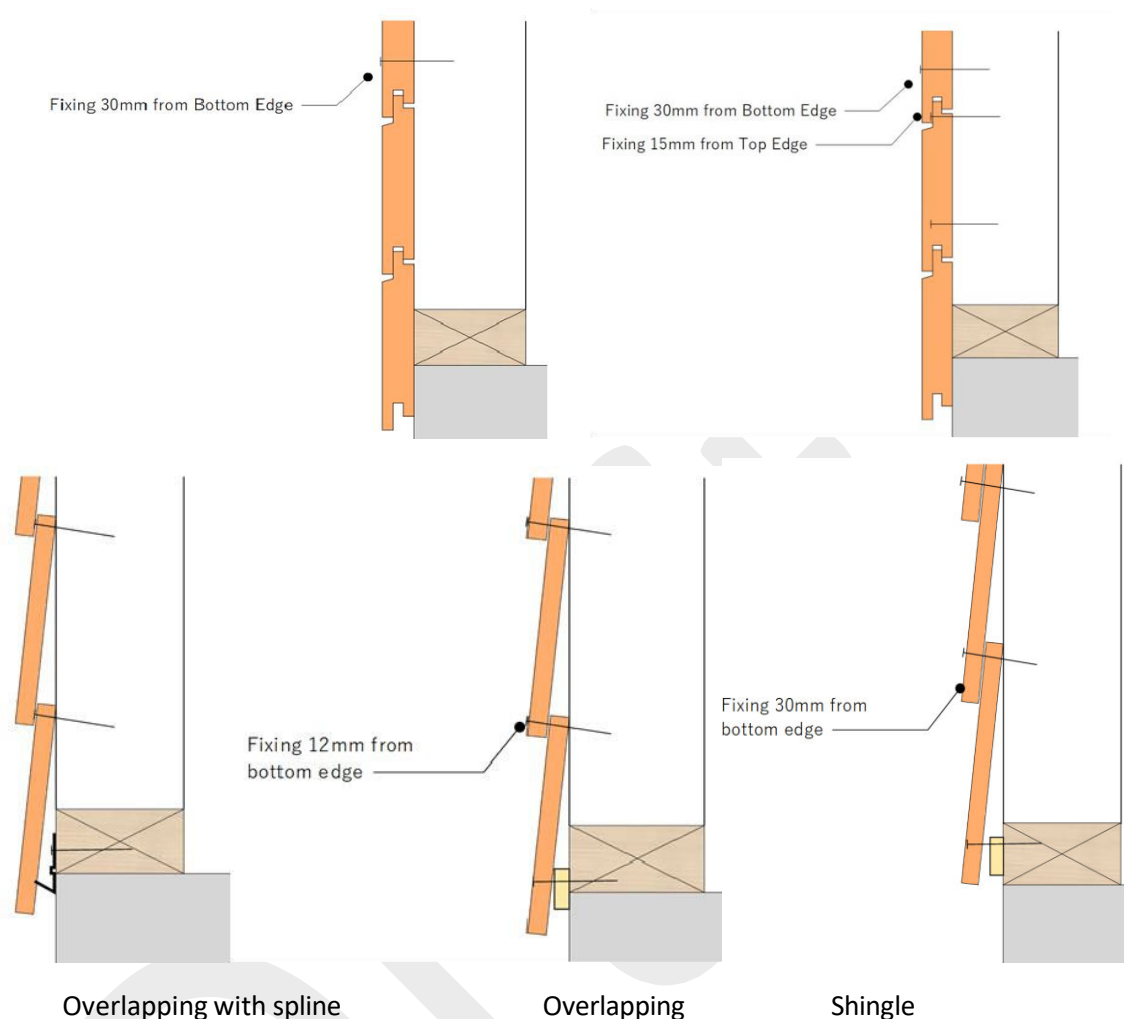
Fasteners Edge distance in Hardboard cladding boards
